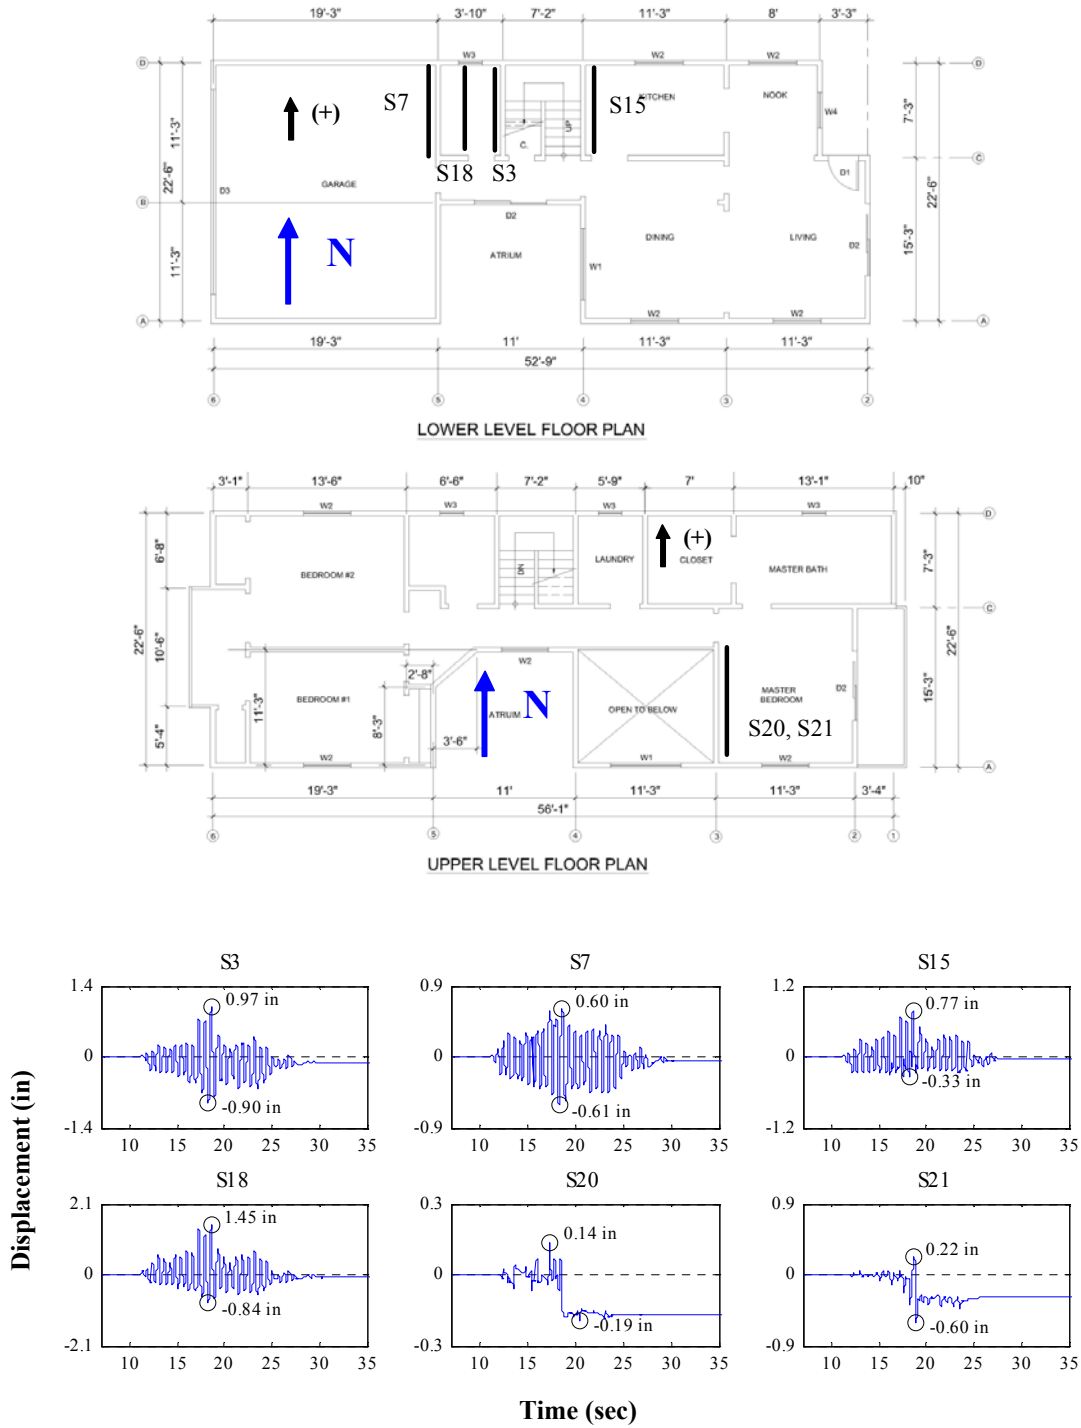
Wall deformations of internal walls for Test NWP5S08
